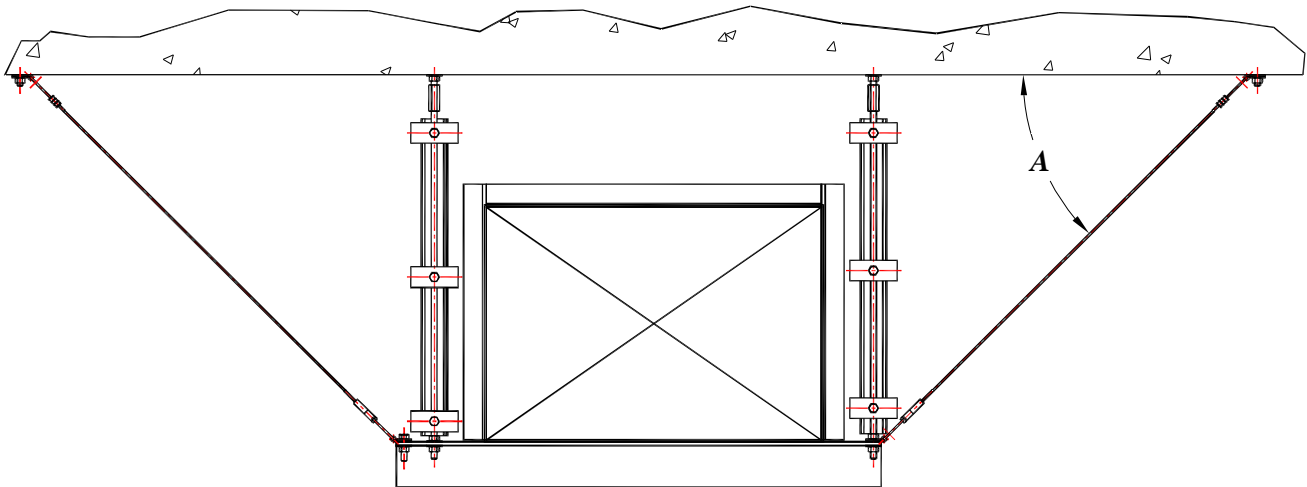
; Typical Transverse Seismic Restraint Arrangement for Trapeze Supported Duct
